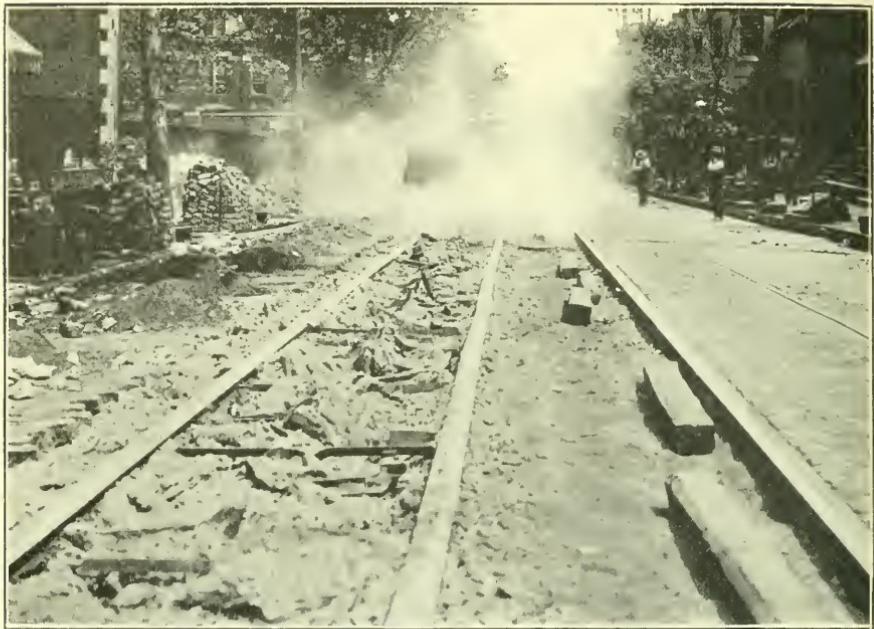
BLASTING CONCRETE IN OLIVE STREET.
